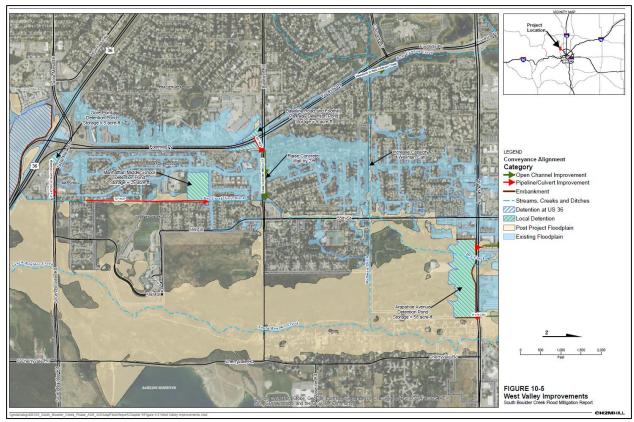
Flood Mitigation Plan West Valley Improvements Plan View
